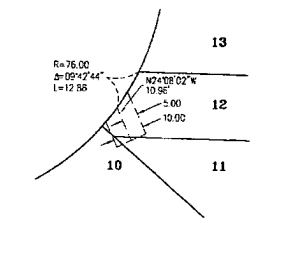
DETAIL-PUBLIC SIDEWALK ACCESS EASEMENT
